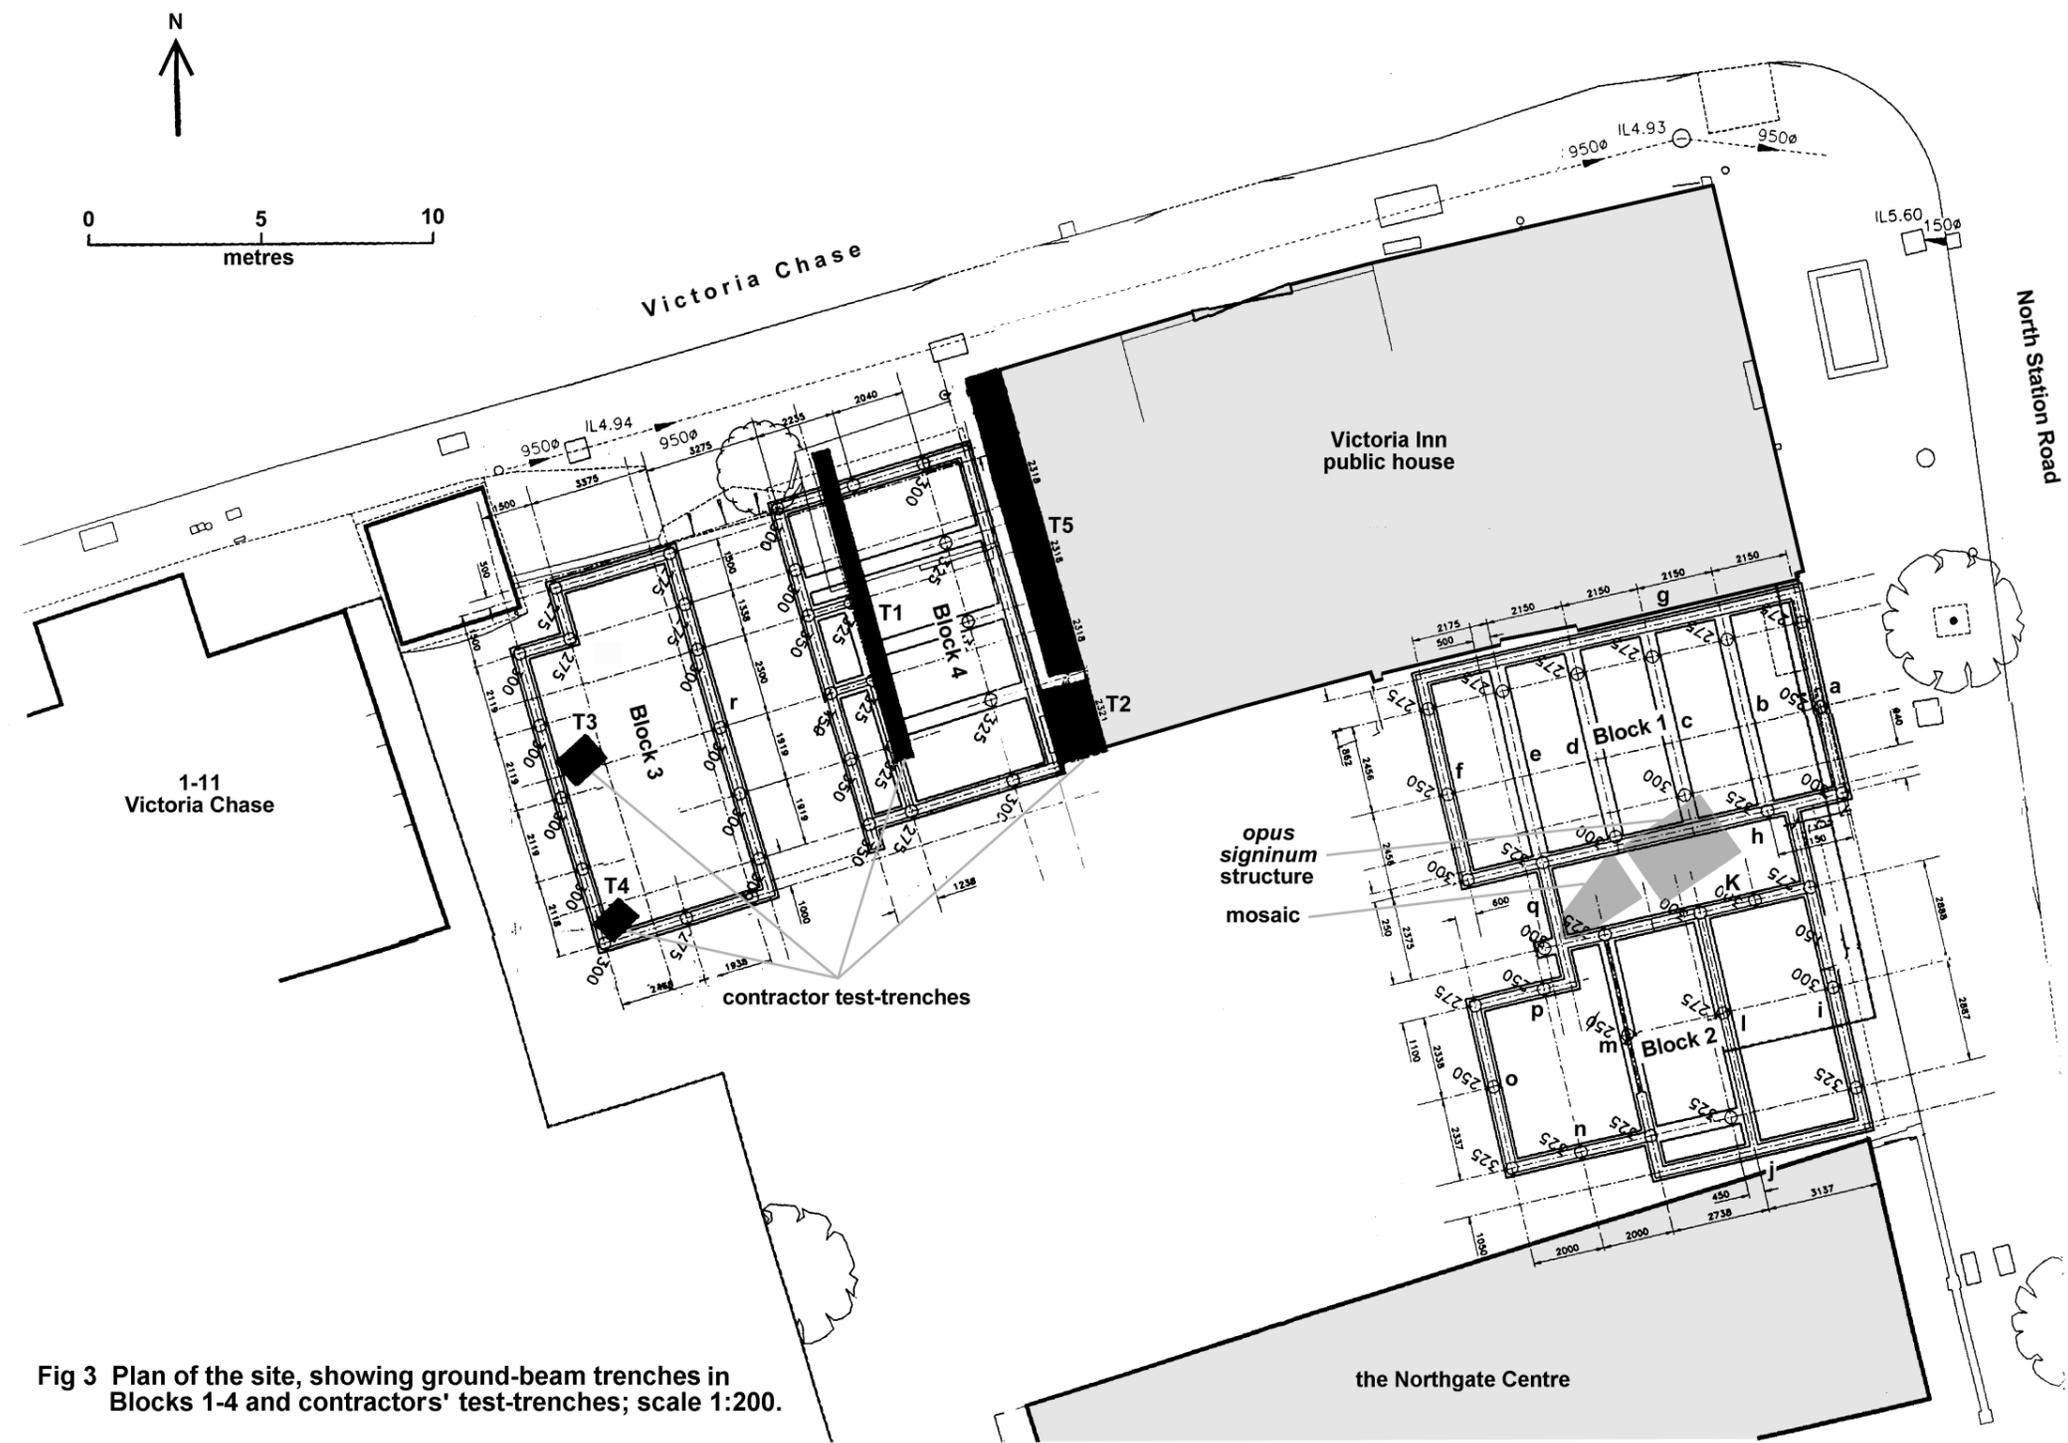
Plan of the site, showing ground-beam trenches in Blocks 1-4 and contractors' test-trenches; scale 1:200.
